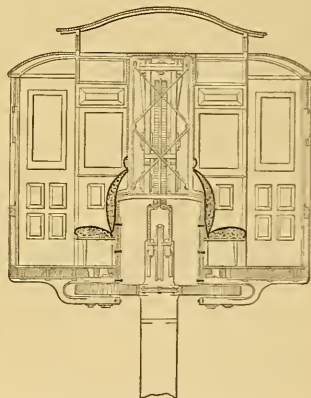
ADAMS' ELEVATED RAILWAY.
